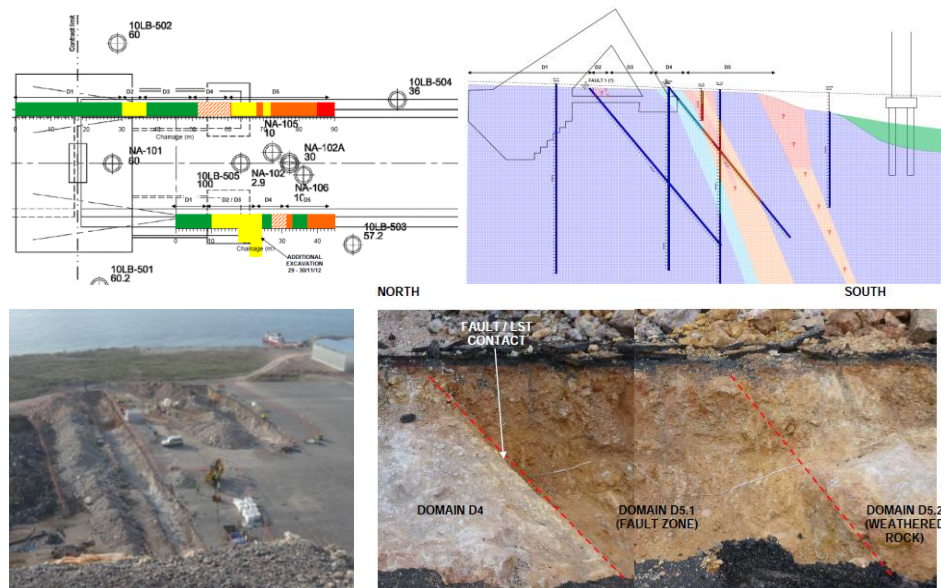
(a) Plan of trial excavations; (b) Cross section showing boreholes and updated geological model; (c) Initial excavation with backhoe; (d) Fault boundary
